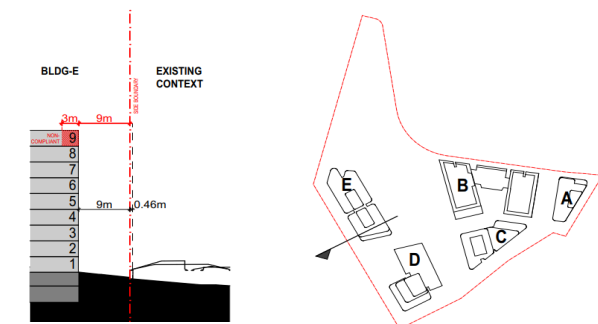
F1.4 Building E boundary condition & Key Plan (NTS)
